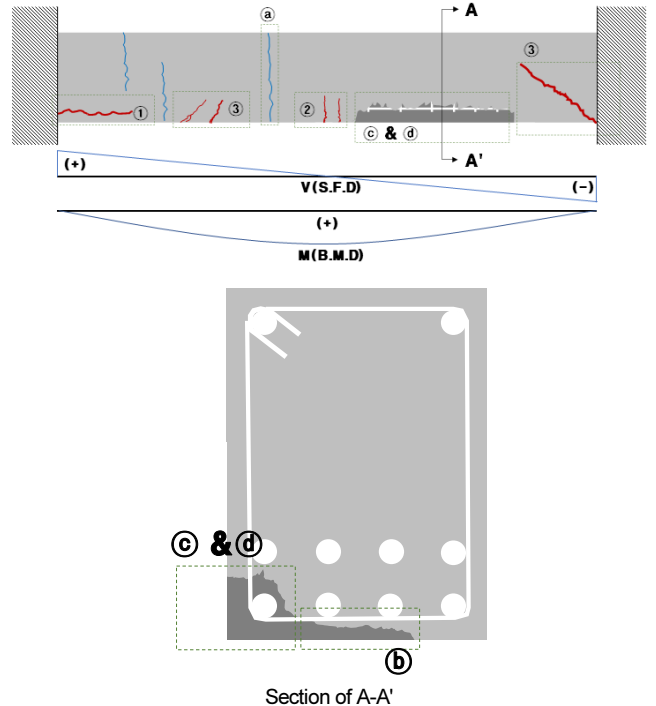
Crack and Damage Type of Reinforced Concrete Horizontal Members (Beams)
